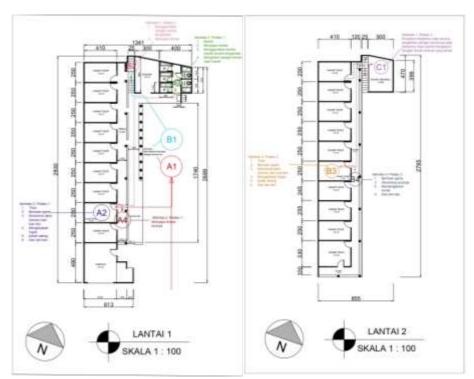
Plan of a Type A boarding house in Gebang Putih Village (Field Observation, 2022)
